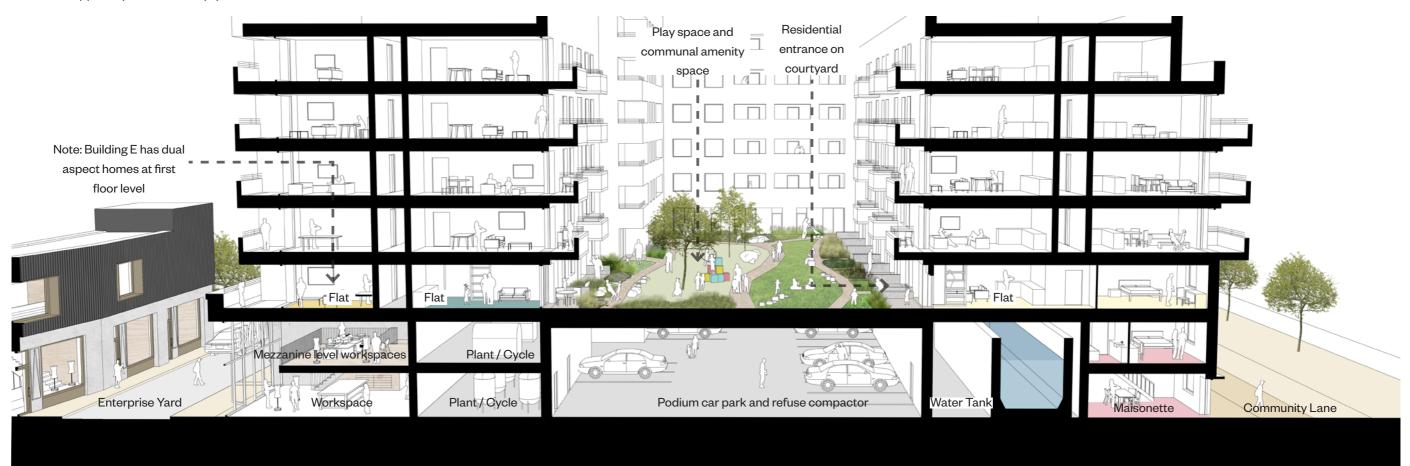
Sectional perspective of building C to illustrate building and podium organisation
